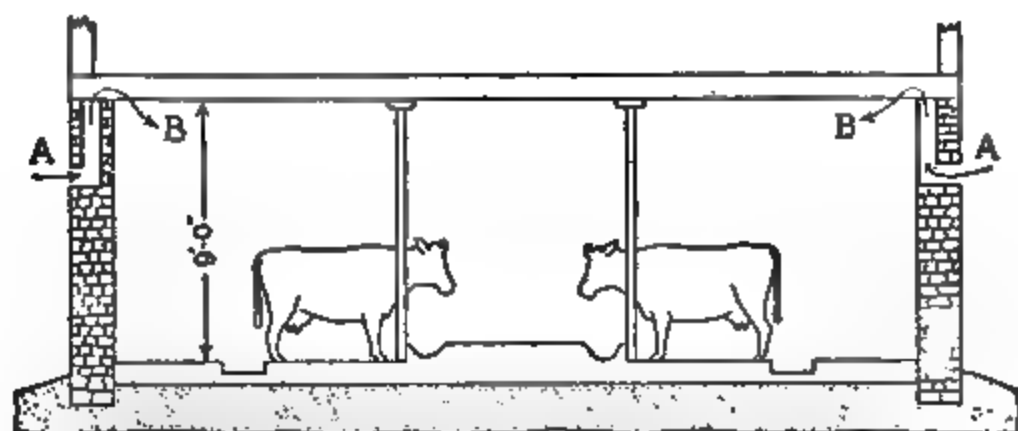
Modification of Fig. 150 where on the right a notch is left in the wall when building, so that the flue rises flush with the inside of the wall. While on the left side the flue is shown built in the wall. This may be done by building around 6-inch drain tile or around a box made of fencing.
